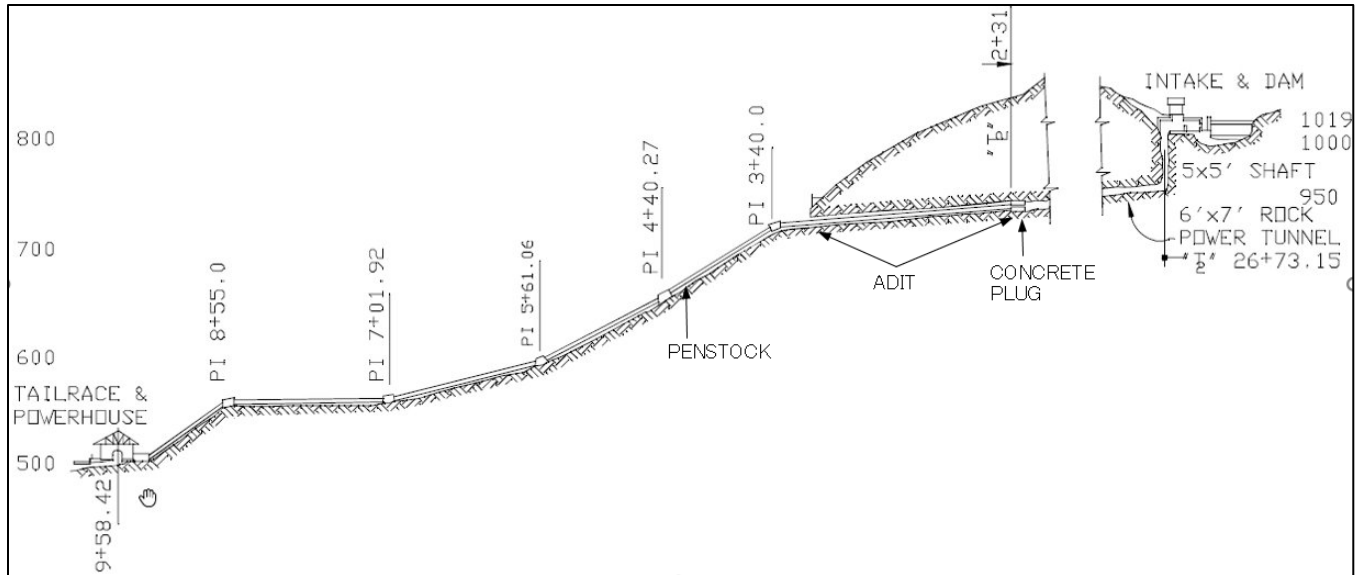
From left to right: the powerhouse, penstock, adit containing the penstock, concrete plug, power tunnel, vertical shaft, intake, and dam.
